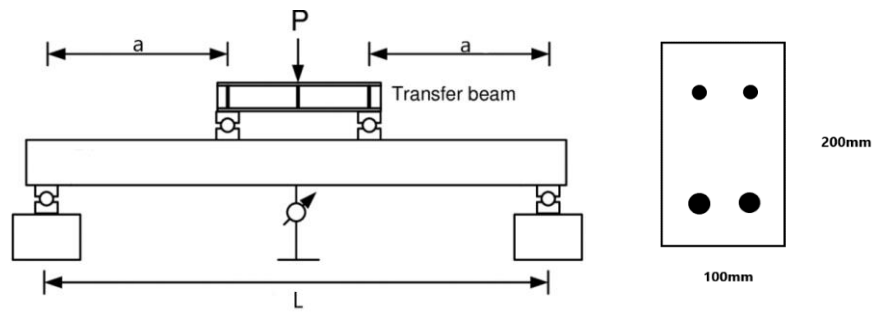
Details and Typical Cross Section of The Tested Beams (Yaseen [36]).
